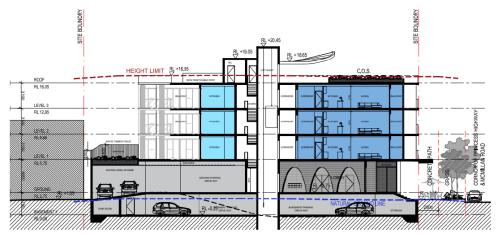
Section Plan showing 14.95m height plane, with lift overrun, amenities and pergola encroaching.
